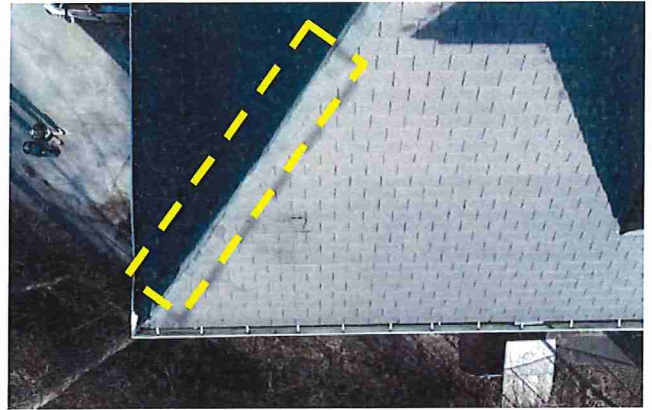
Drone image shows deterioration of shingles on the southwest hip of the roof (dashed outline).
